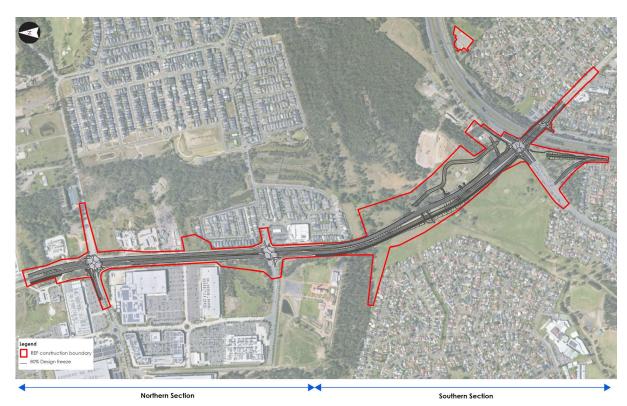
Richmond Road construction staging Stage 1 (northern section) and Stage 2 (southern section)
